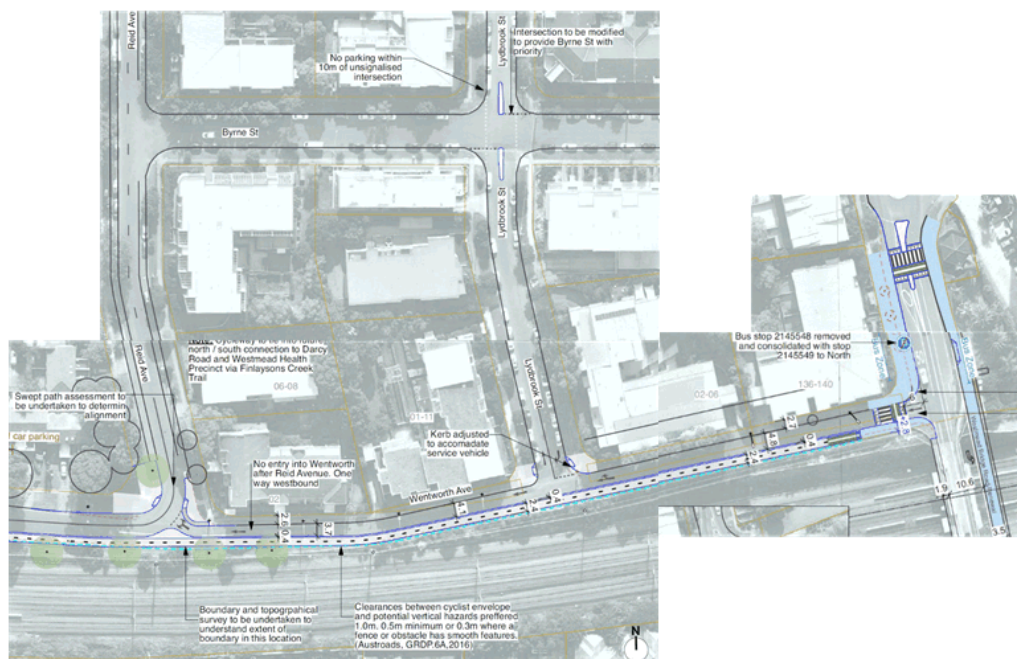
Stage 2 Concept Plans (Reid to Bridge)
